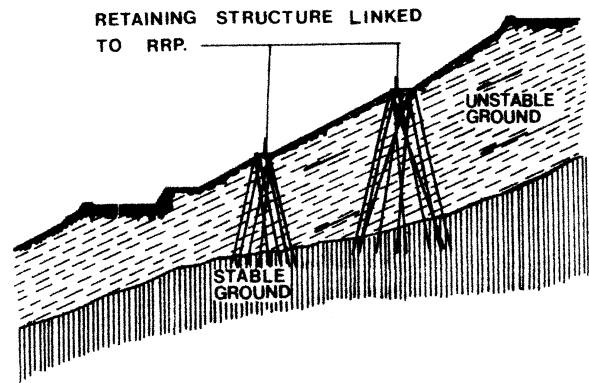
E.U.R. Rome. RRP retaining wall in loose soil
